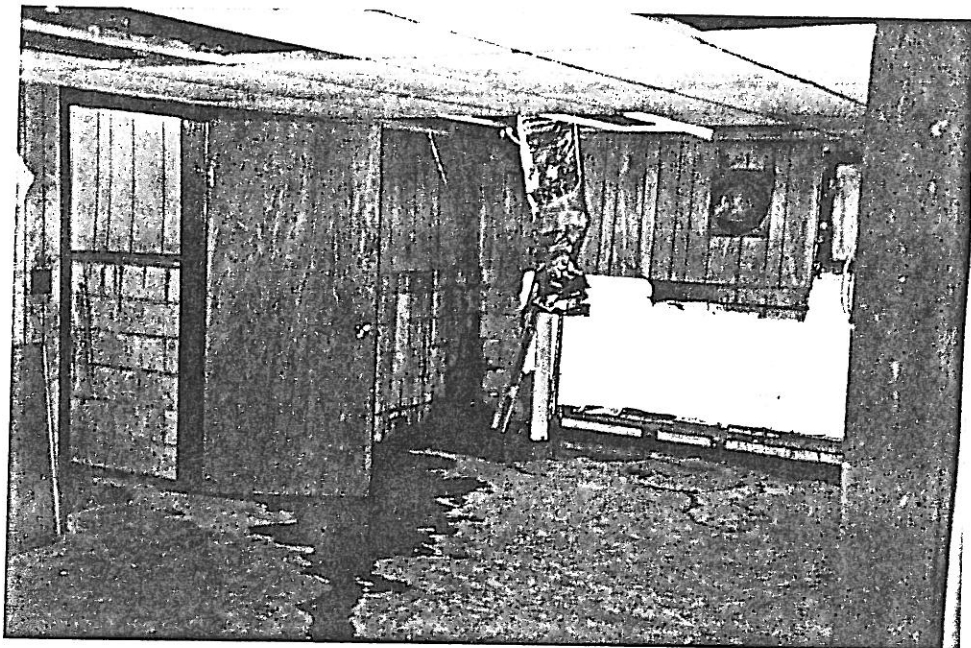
BASEMENT AREA; THE UNFINISHED PORTION ACCESS DOOR IS AT LEFT, POSSIBLE POINT OF WATER ENTRY IS AT THE FAR CORNER OF THE BLOCK FOUNDATION WALL.
